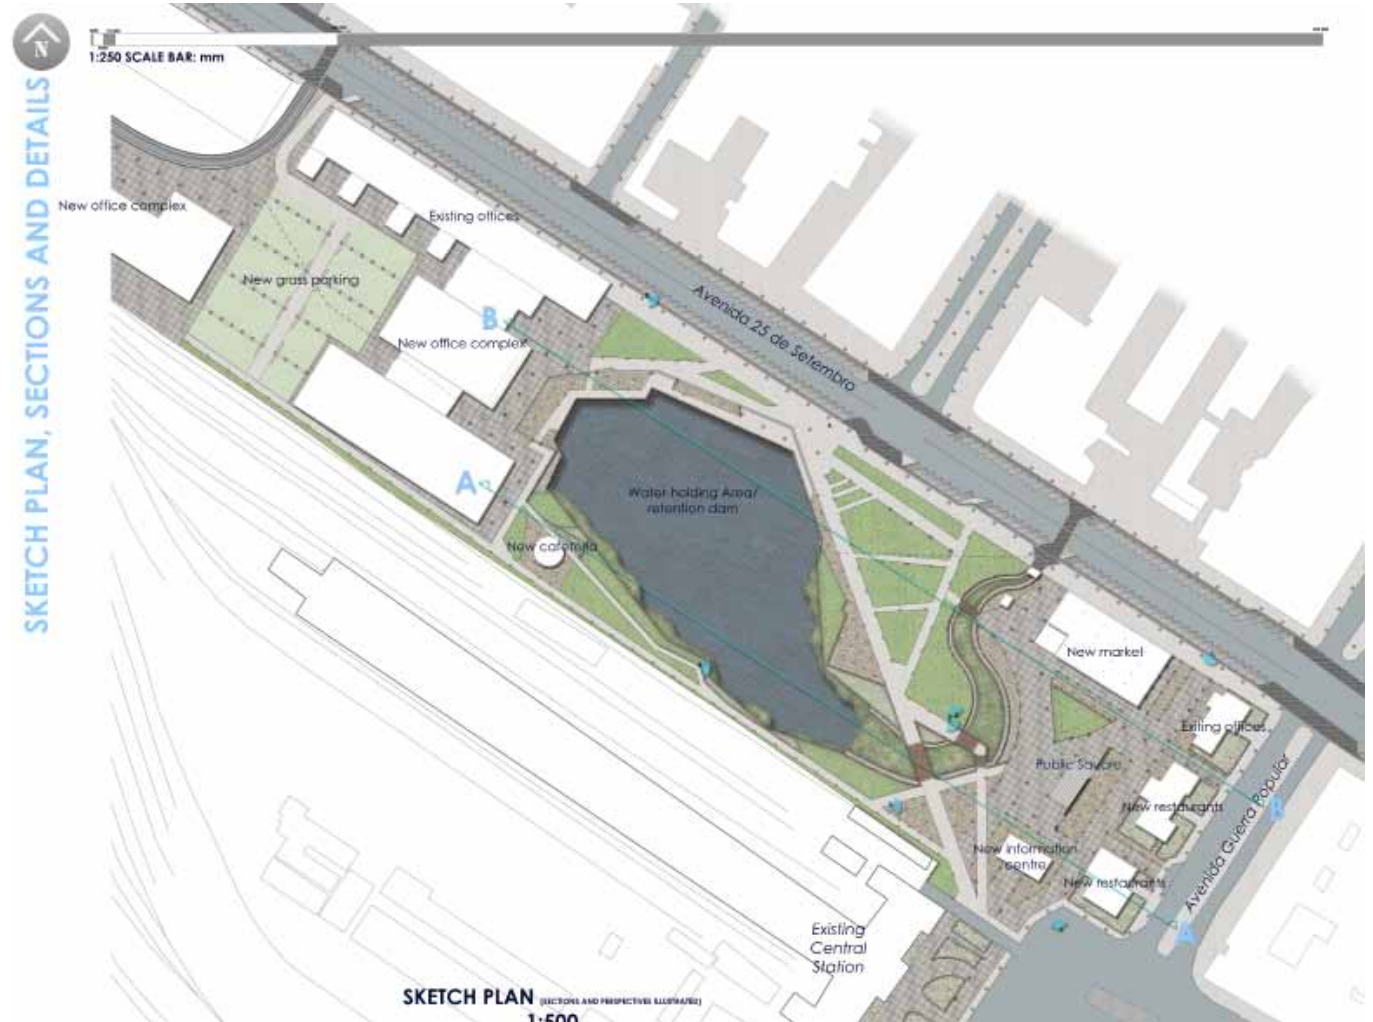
SKETCH PLAN ILLUSTRATING SECTIONS (AUTHOR, 2011)
